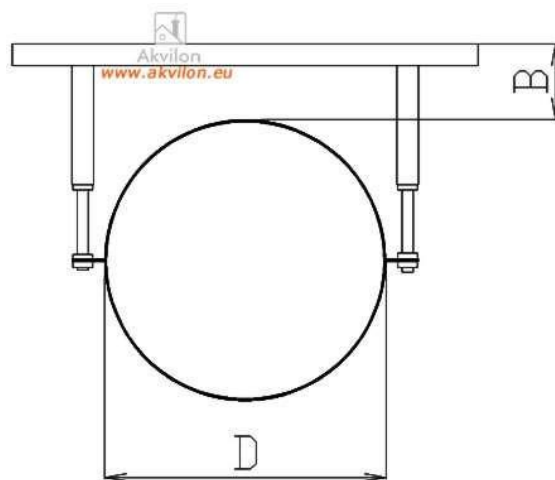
Connection of chimney elements by fastening with connecting clamps
